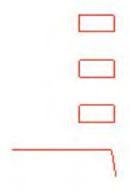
ST-75 Bridge Rail FE Shell Model Profile
